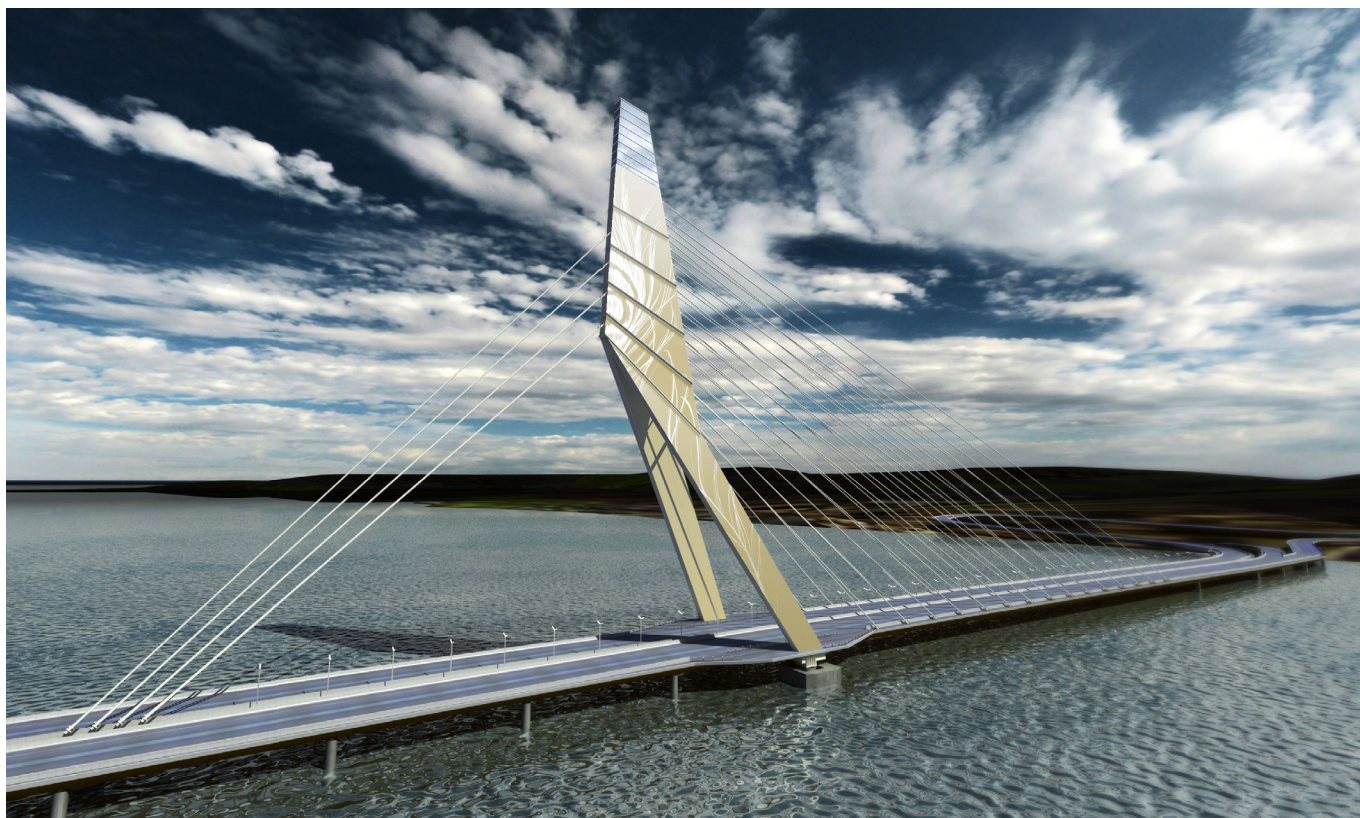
Image of the Signature Bridge in New Delhi, with ornamental painting on the pylon. ©schlaich bergemann partner
